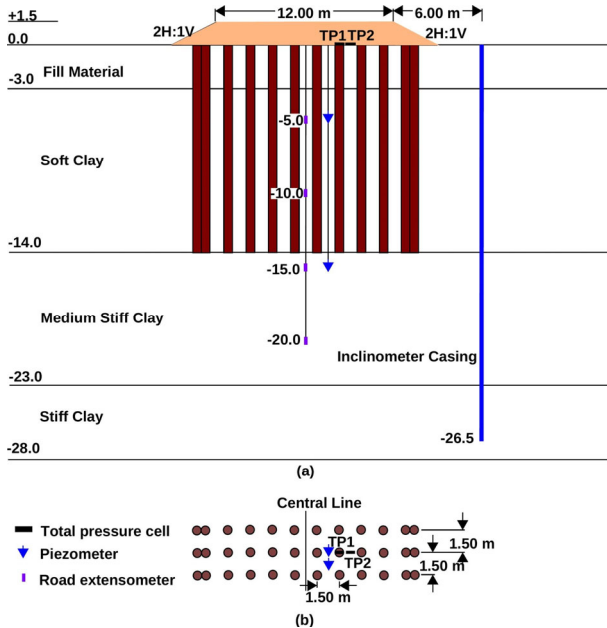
(a) Cross section and (b) Plan view of Bangbo Embankment in Thailand (Jamsawang et al. 2016)
